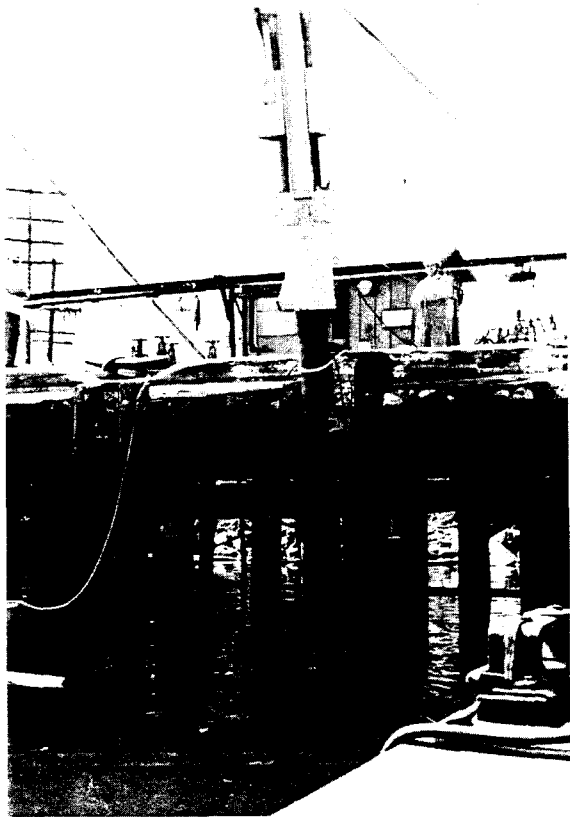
Installation of a plastic-steel composite pile in a waterfront application. The existing piles are timber (Photo courtesy of Plastic Pilings, Inc.).
